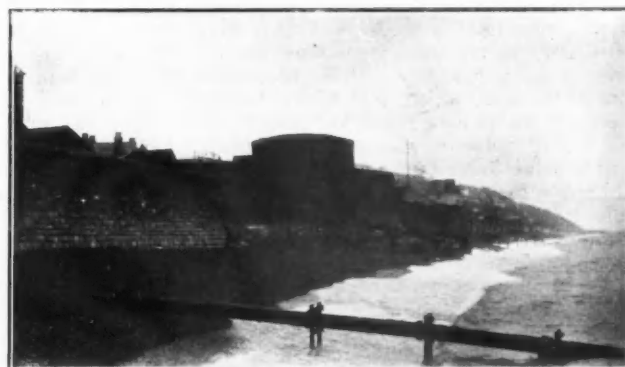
Storm damage to Sandgate Castle due to depletion of the beach shingle.
